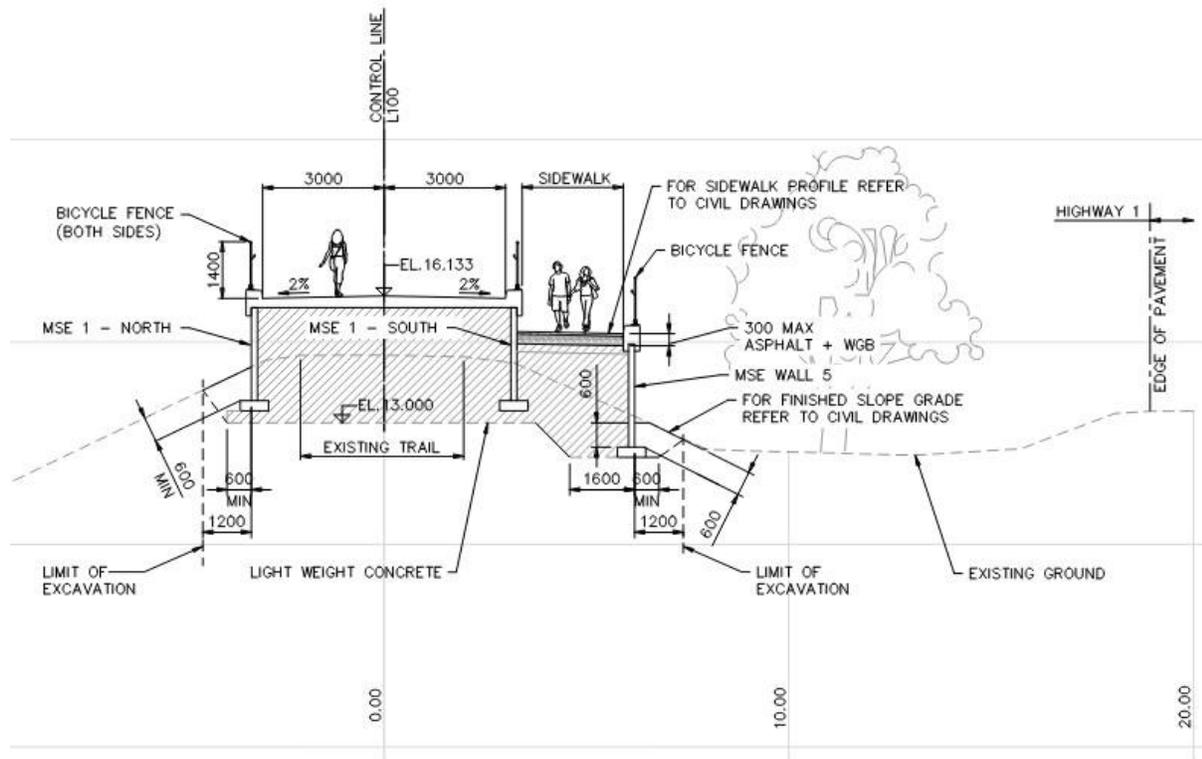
shows a typical cross-section of the approach ramps, comprising MSE walls supporting a concrete slab:
